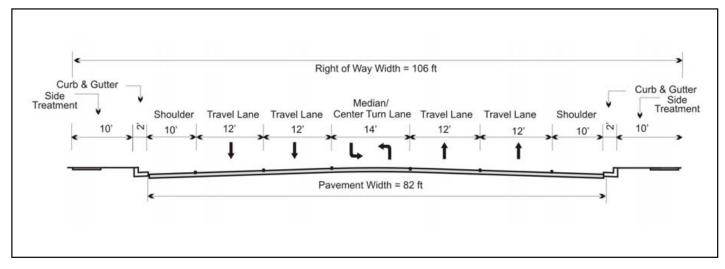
Five-lane Arterial Cross-section, Between Intersections
